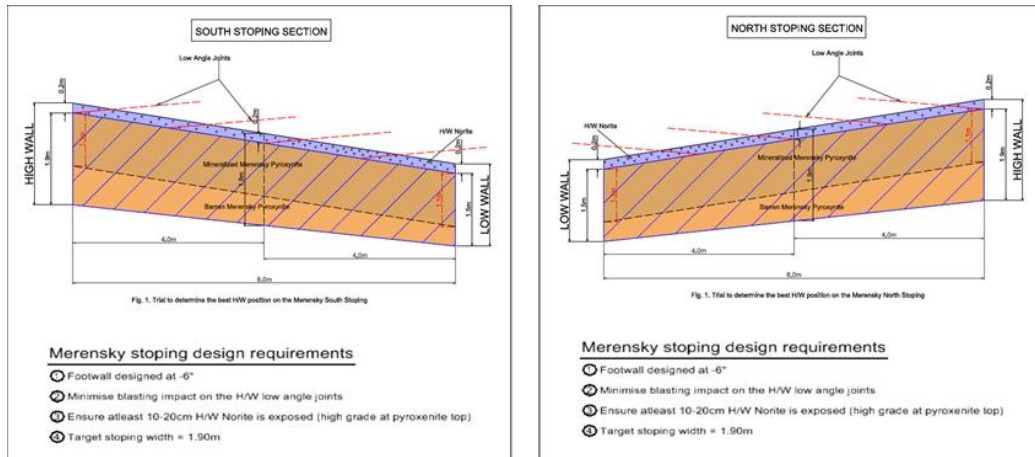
Typical Booyssendal Merensky bord high wall 1.9m and low wall 1.7m
